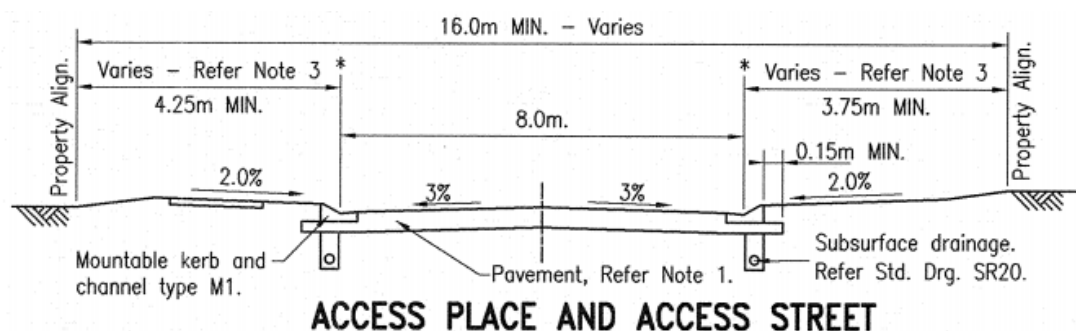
Access Place and Access Street Typical Road Cross Section
